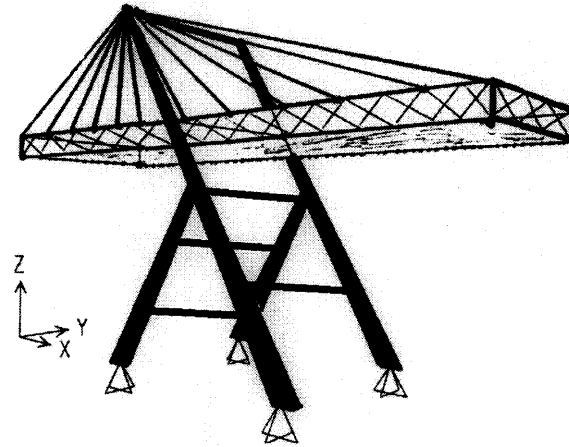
Perspective View of the Roof Truss, Cables, and Piers
